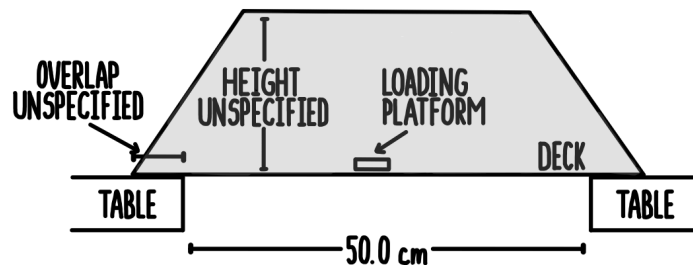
Sideview of the bridge setup. The bridge will be positioned between two tables placed 50 cm apart. The overlap onto the table is unspecified but it is recommended that the bridge be no less than 55.88 cm (22 inches).
